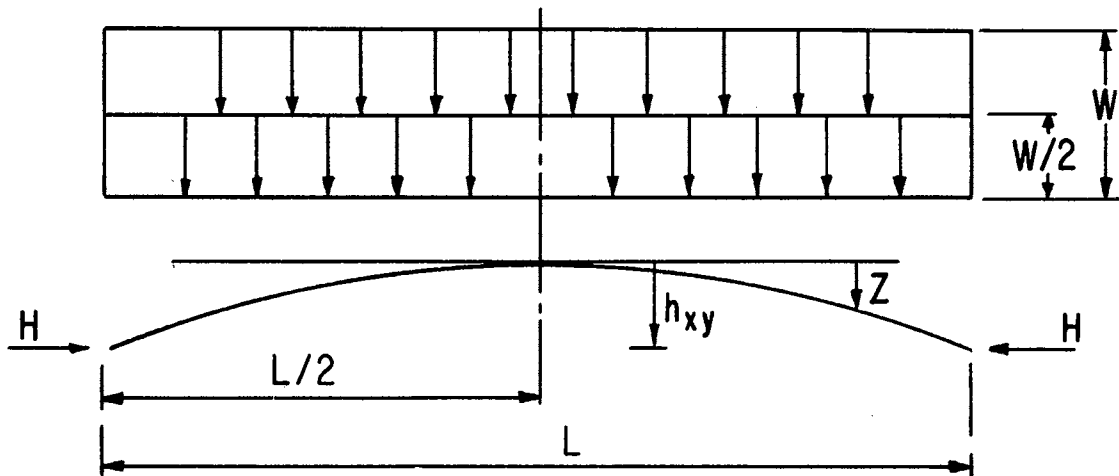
A Typical Parabolic Arch With Horizontal Load Distribution.
